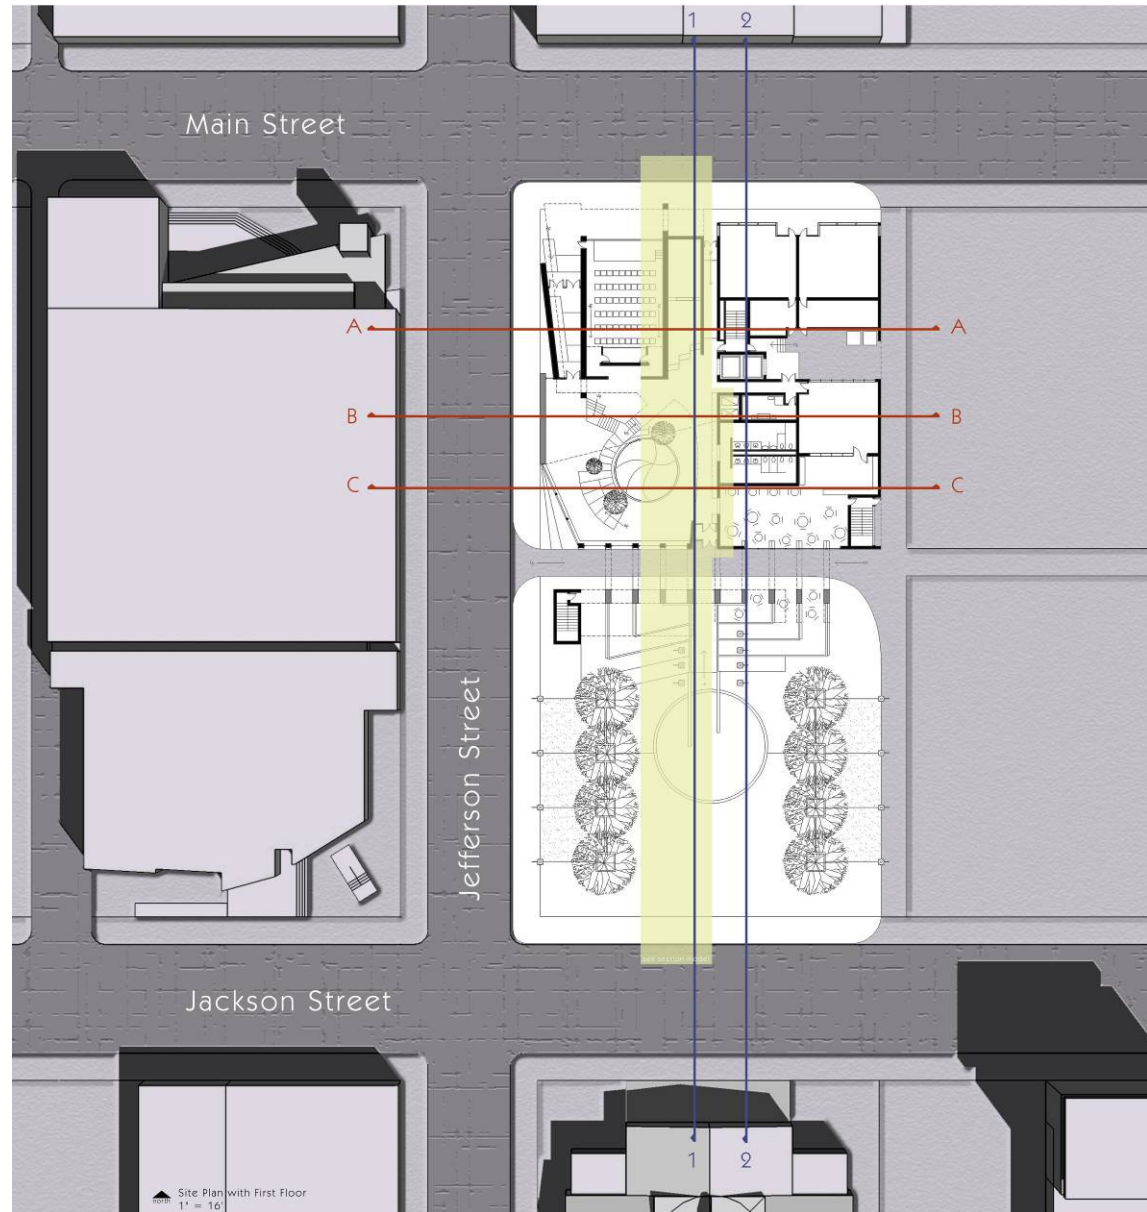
Site Plan with First Floor Plan and section lines (Page 39). Central band indicates location of section model (Page 57).
